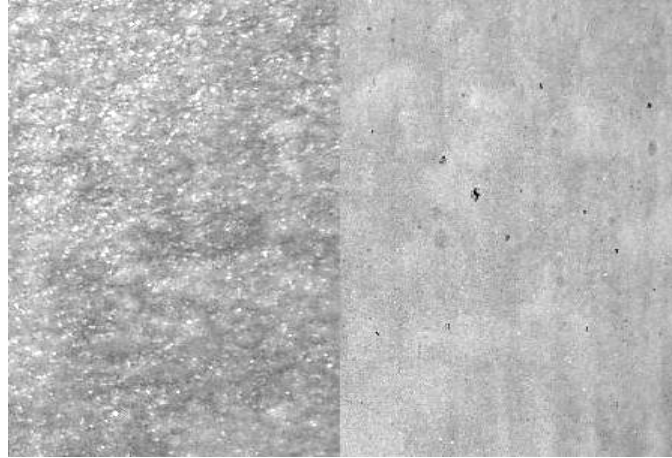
Surface appearance of specimens cast with CPF (left) and with ordinary formwork (right)
